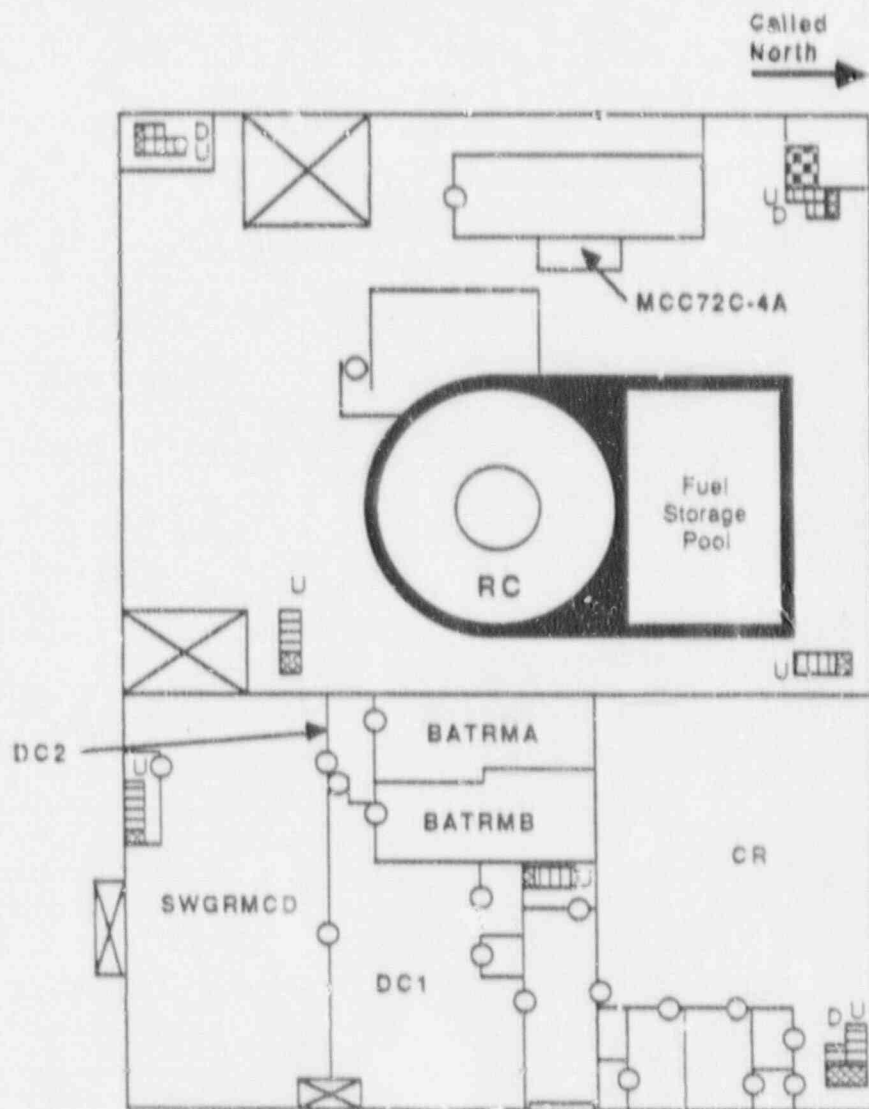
Enrico Fermi Unit 2 - Reactor Building - 641 ft. Elevation
